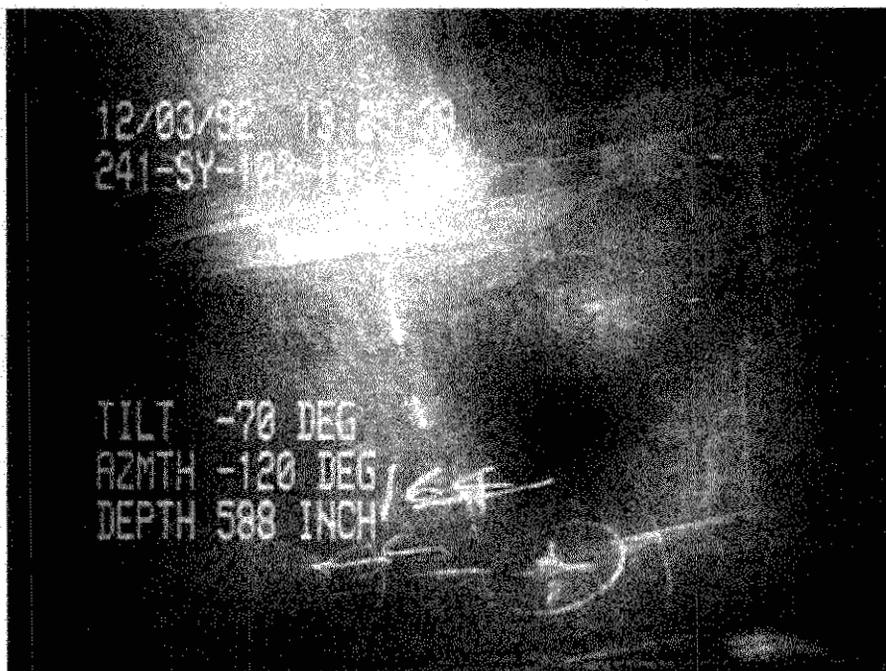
SY-103 Riser 40 (18G), Primary Tank, Knuckle Weld (1992)
